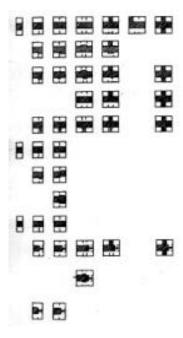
The Matrix of Planimetric Organizations of the 'Turkish house: plan type with an inner sofa
